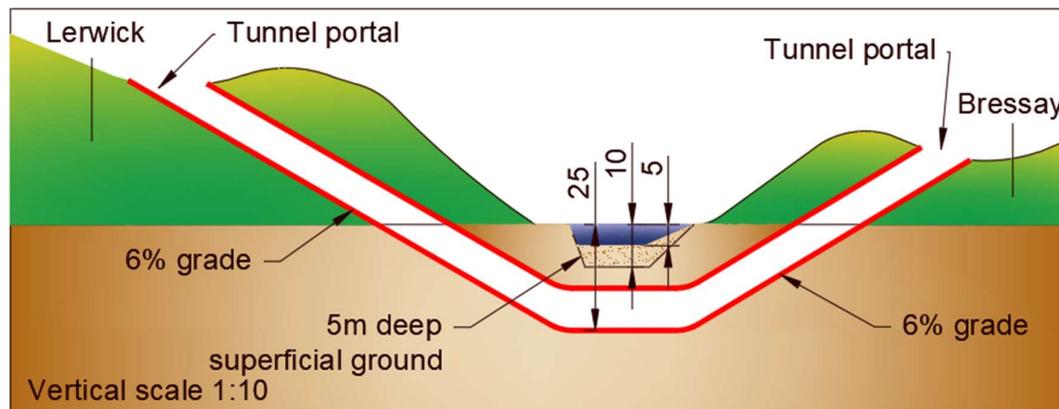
Lerwick to Bressay subsea tunnel - long section
